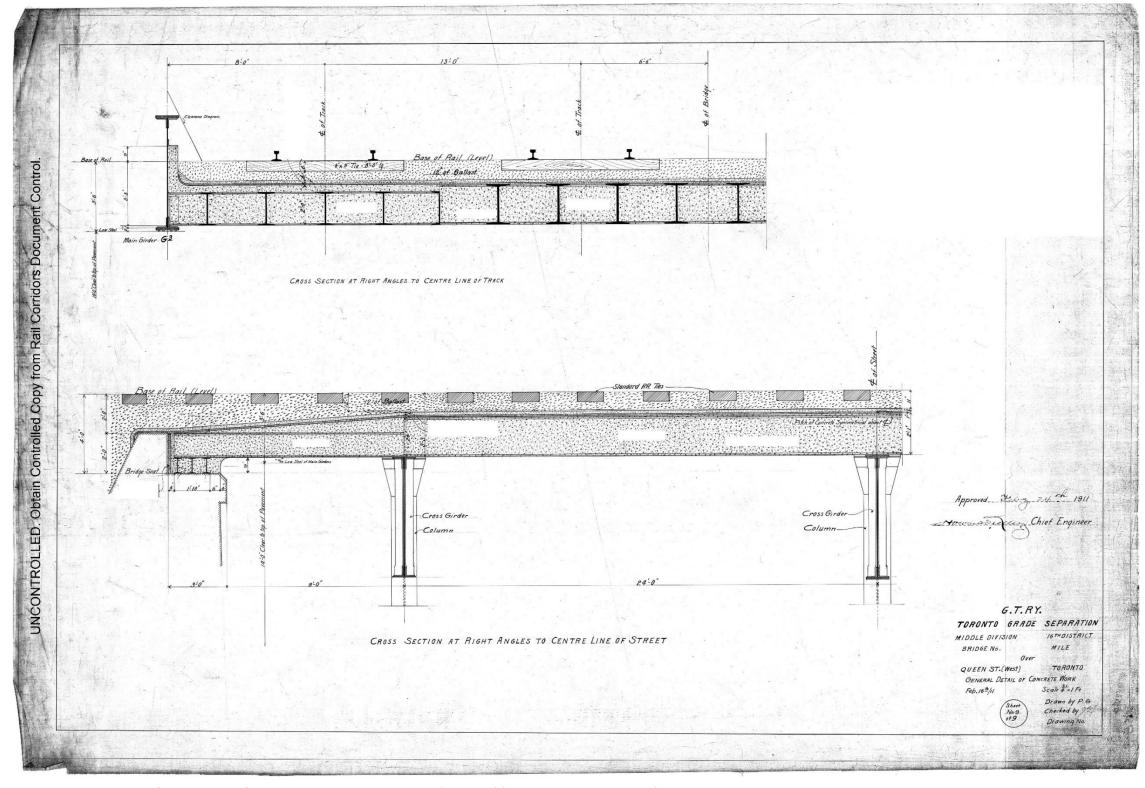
General detail of concrete work for the Former Queen Street Bridge (Mile 5.15) (Grand Trunk Railway 1911d)
